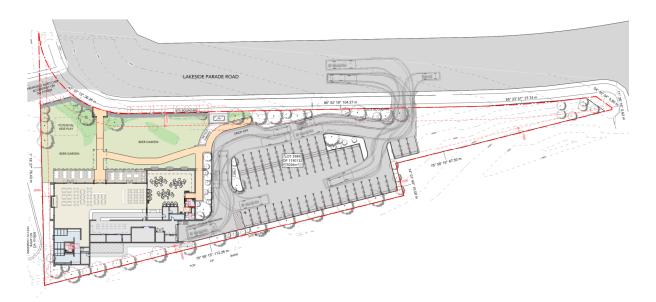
Site Plan of the Proposed Development at LOT 3989 Lakeside Parade & Jubilee Drive, Jordan Springs
